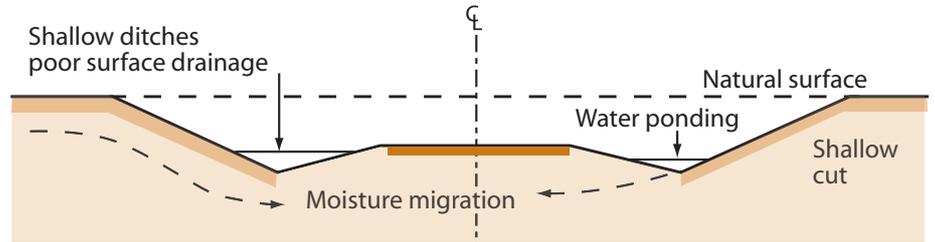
Potential drainage problems associated with depressed pavement construction
